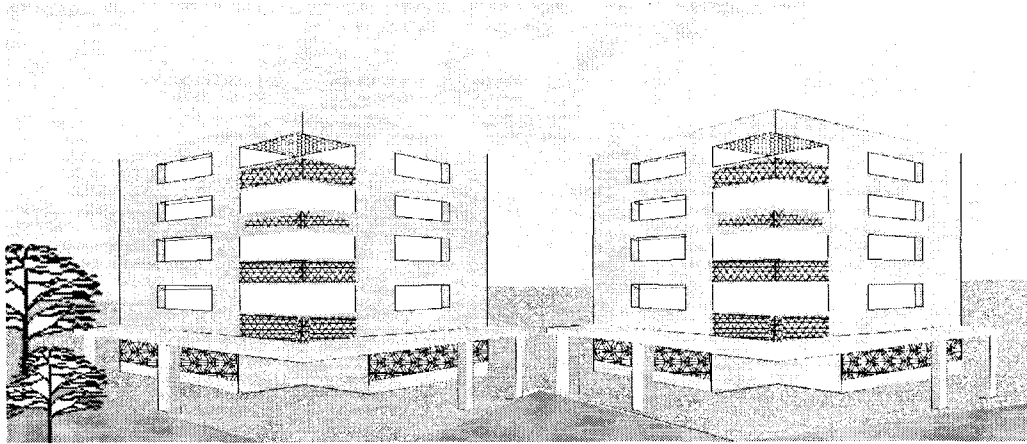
Jalis used as balcony parapets and dead walls as seen above.
